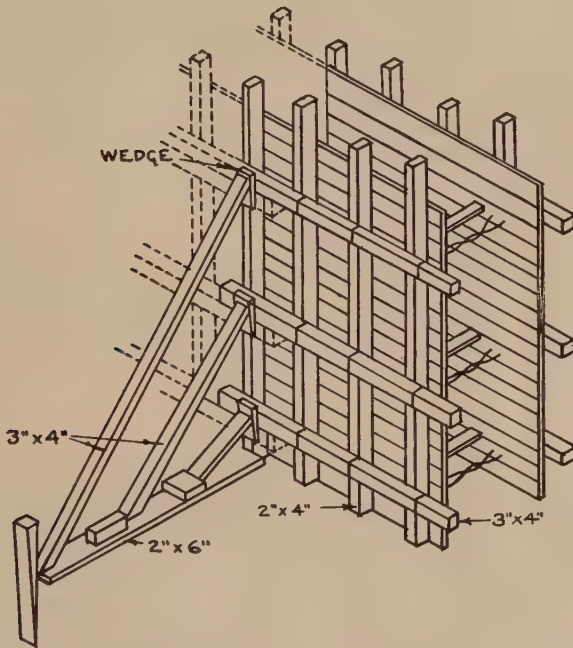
Method of holding wall forms in place; using wales and diagonal braces.
